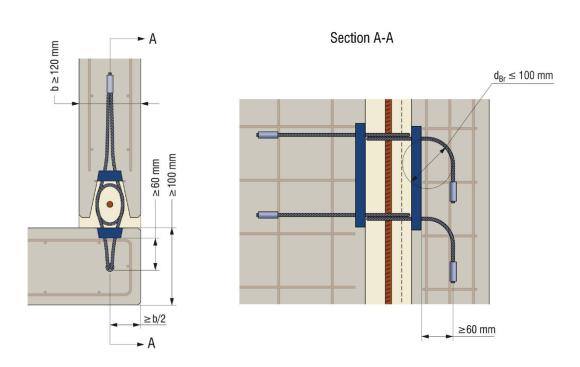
Wall - Wall - CORNER CONNECTION - detail with minimum reinforcement
